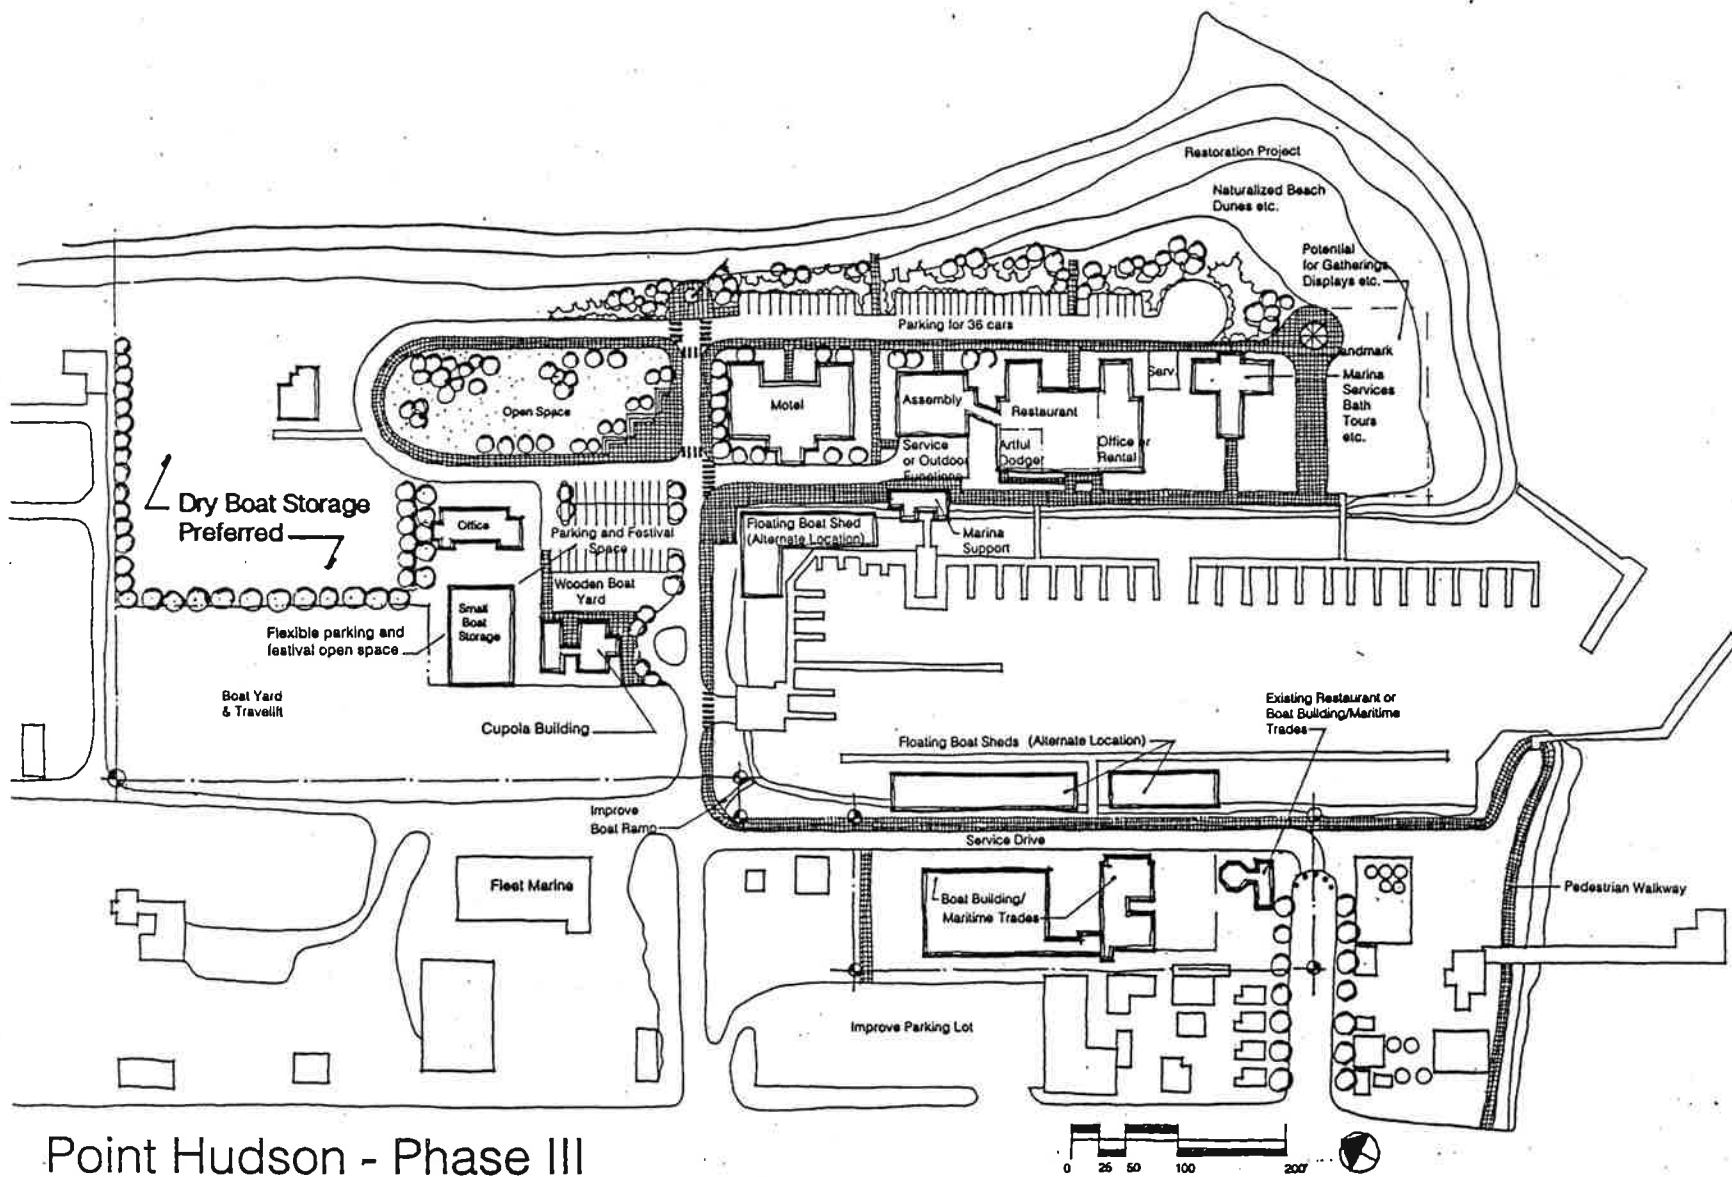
Concept Plan Illustrating Specific Use and Design Recommendations
